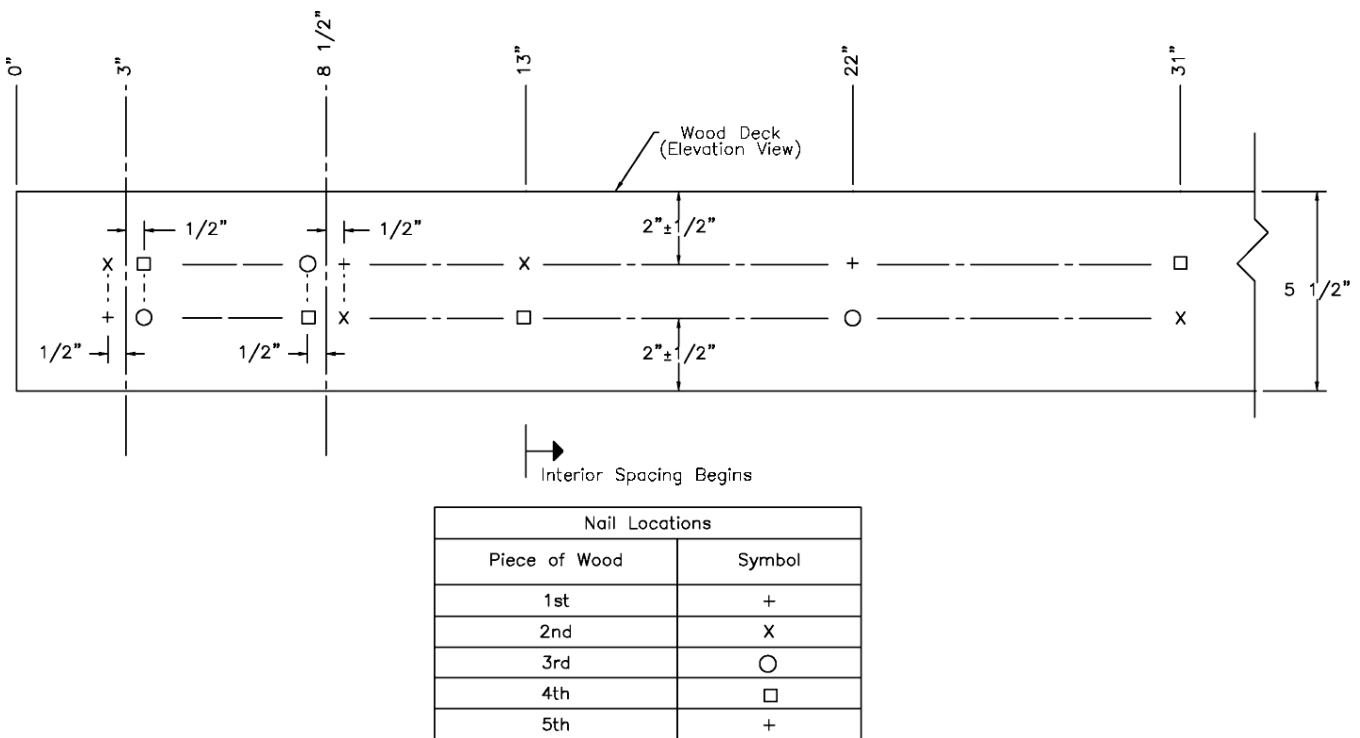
Exterior and interior nail pattern used to connect boards (with key to symbols at bottom).
